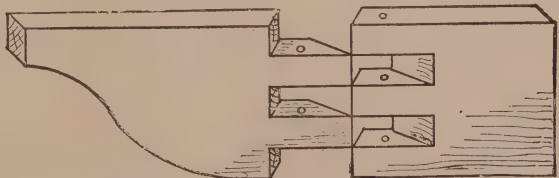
Finished Parts of Bearer, Ready for Fixing
